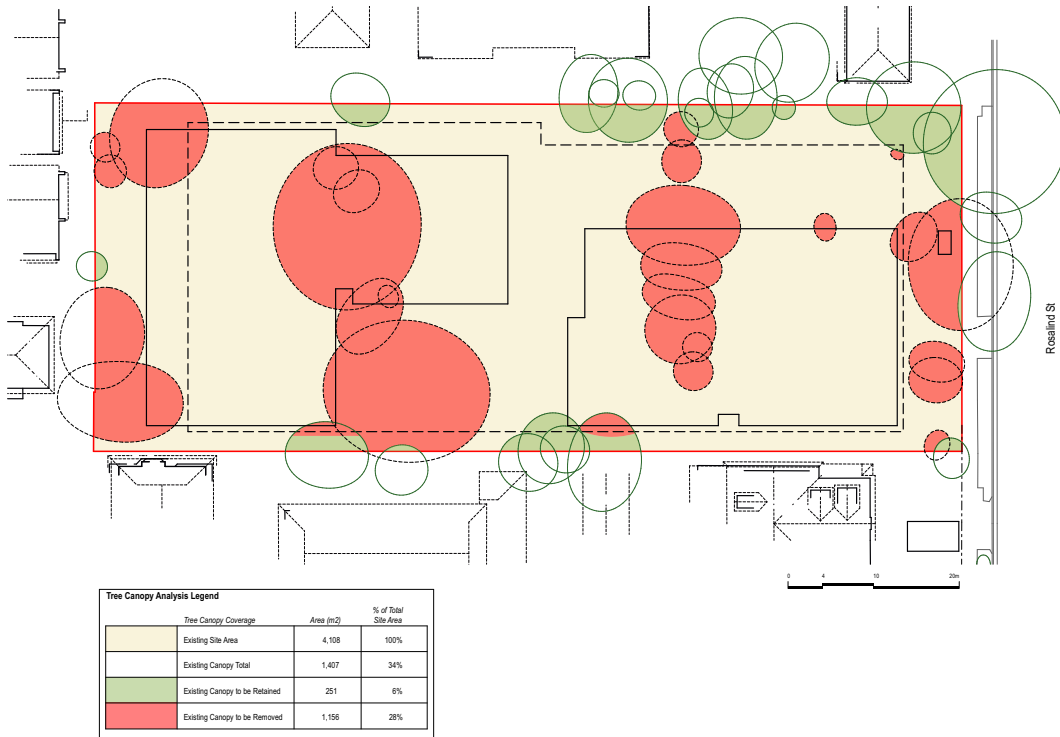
Overall site plan showing the site and its existing urban canopy cover and relative percentages. (Source: Arterra)
